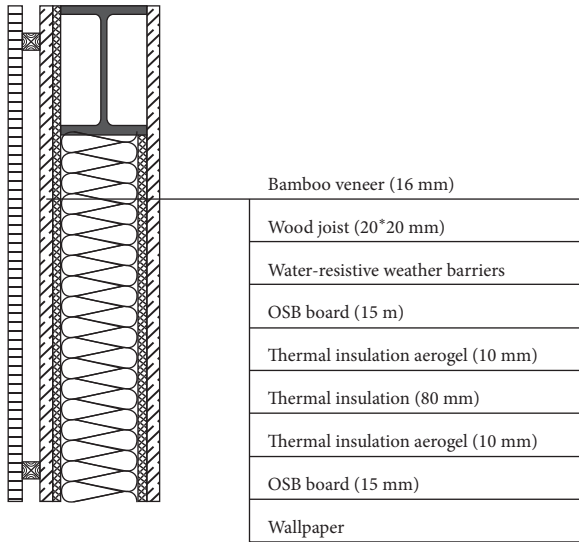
Construction design detail of an exterior wall using AB as the insulation material (source: authors' own data).
